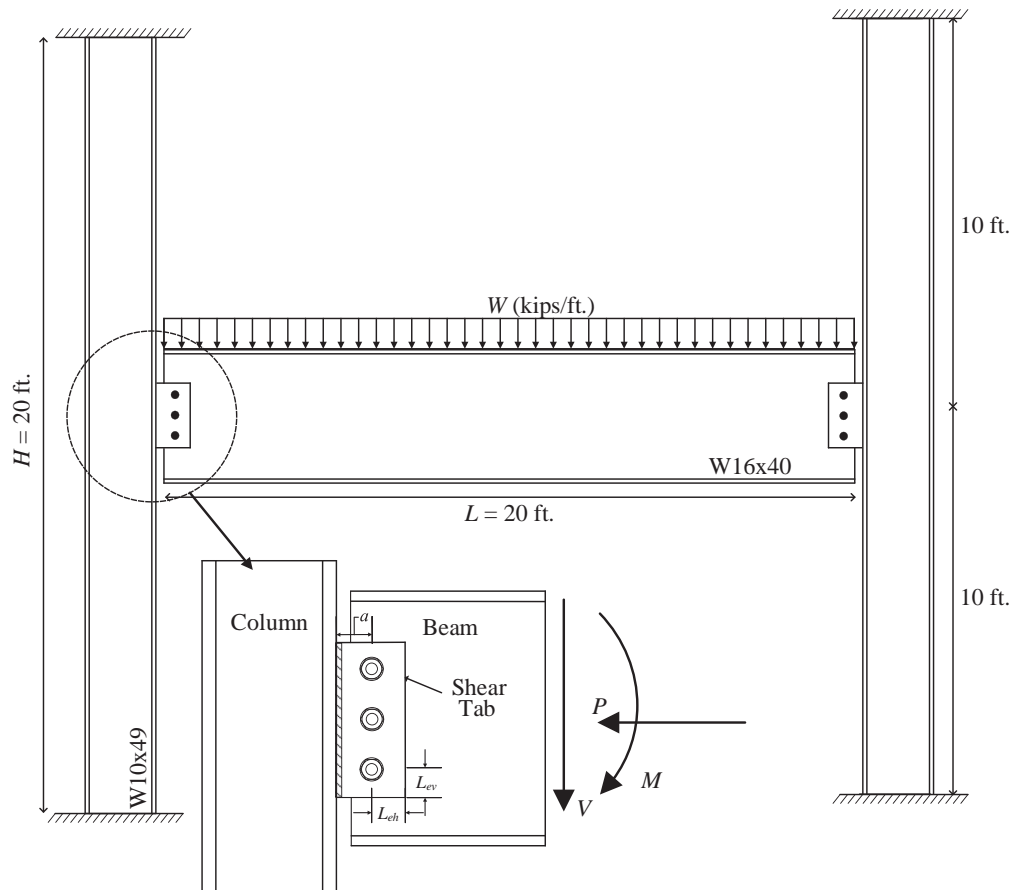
Example 1 configuration of column-beam frame system connected with a single plate.
